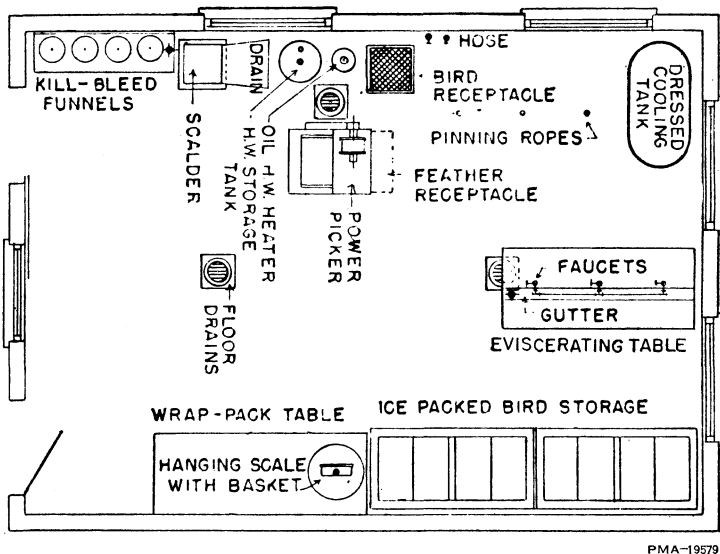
Suggested floor plan for a small farm processing plant employing two to five workers.
